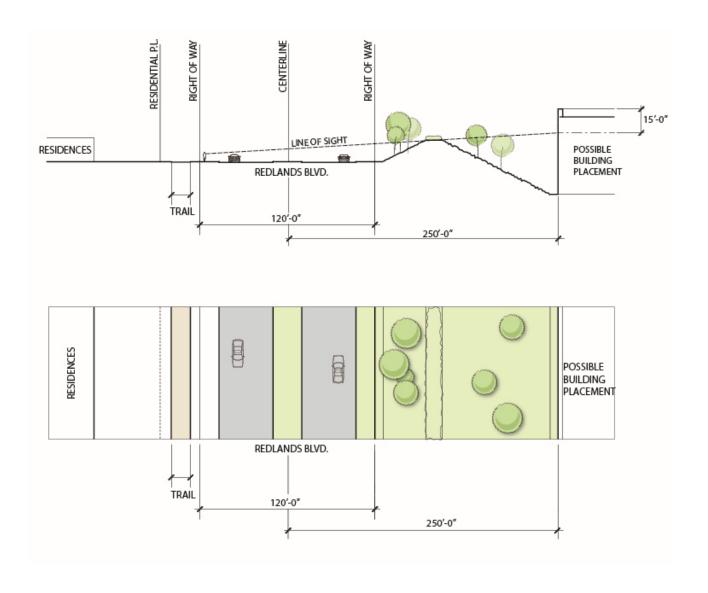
, 4-6 Redlands Blvd. Section B and Plan View B (pg.4-7)
